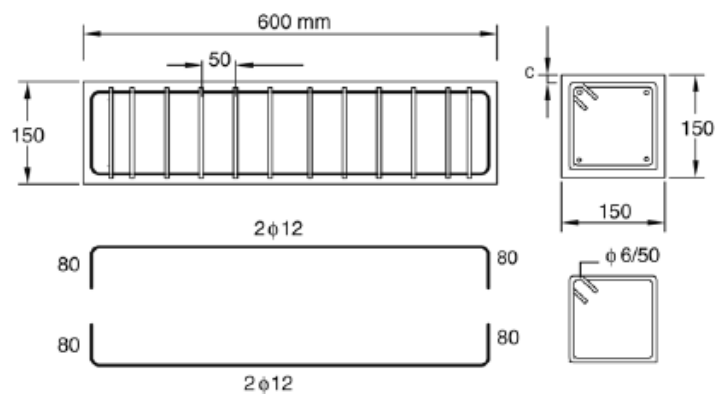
Reinforcement details and geometry of beams (Campione & Mangiavillano, 2008)
